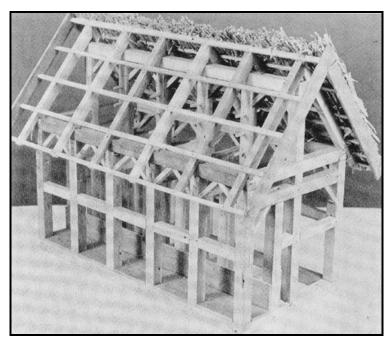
Barn with a thatched roof and vertical post walls, Rang Saint-Georges, Rigaud, Québec (Canadian Museum of Civilization).
